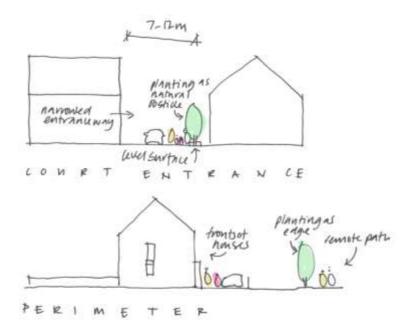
RESIDENTIAL STREET INDICATIVE LAYOUT
